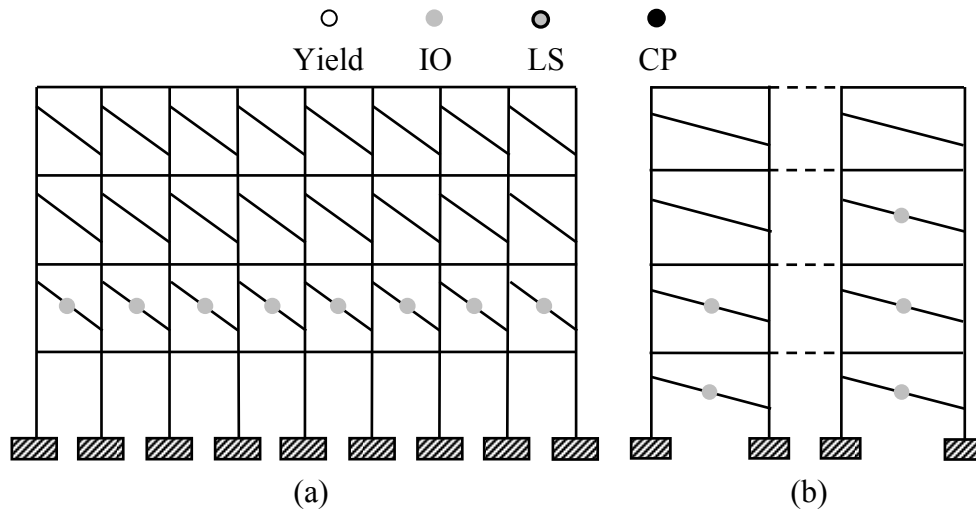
Hinge pattern at performance point for DBE of four storey RC infilled frame building designed as SMRF as per relevant Standards with one front bay open in ground storey: (a) open front bay in longitudinal direction; (b) typical transverse frame.
